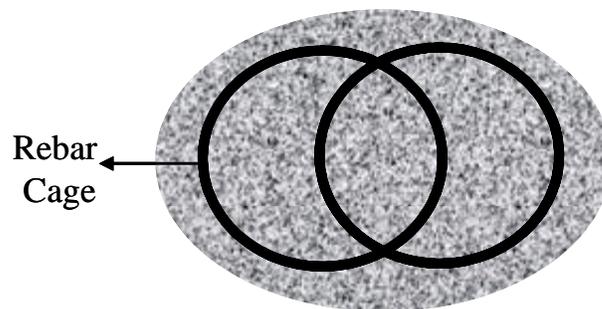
Oval Shaped Column with Figure 8 Rebar Cage (not to scale)
